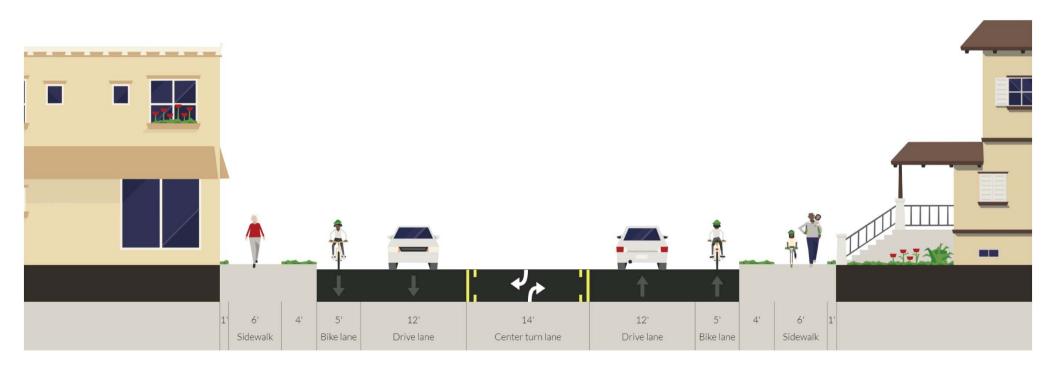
Planned roadway section with minimum 70' right-of-way.
